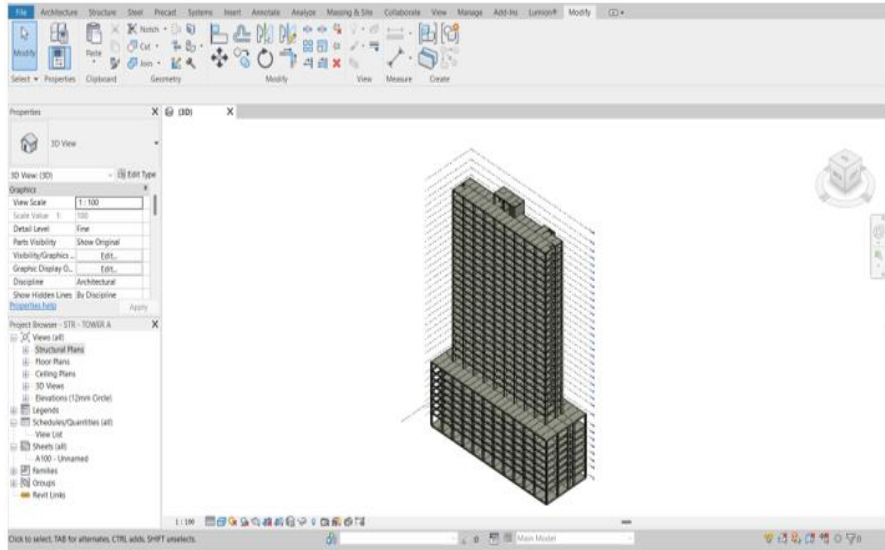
3D Architectural Modelling for Tower A Model Structure
